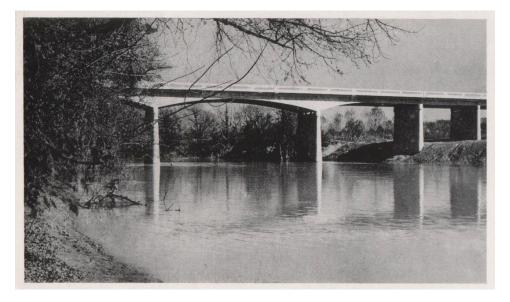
Bomber Plant Bridge soon after completion of construction
